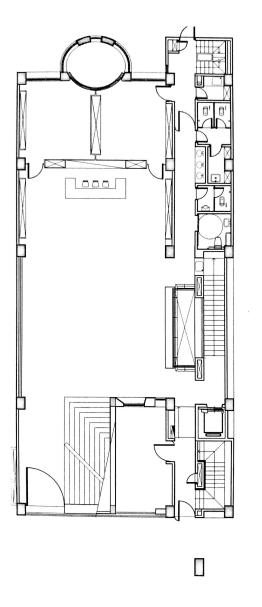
First Floor Plan of the Luminary Buddhist Center
